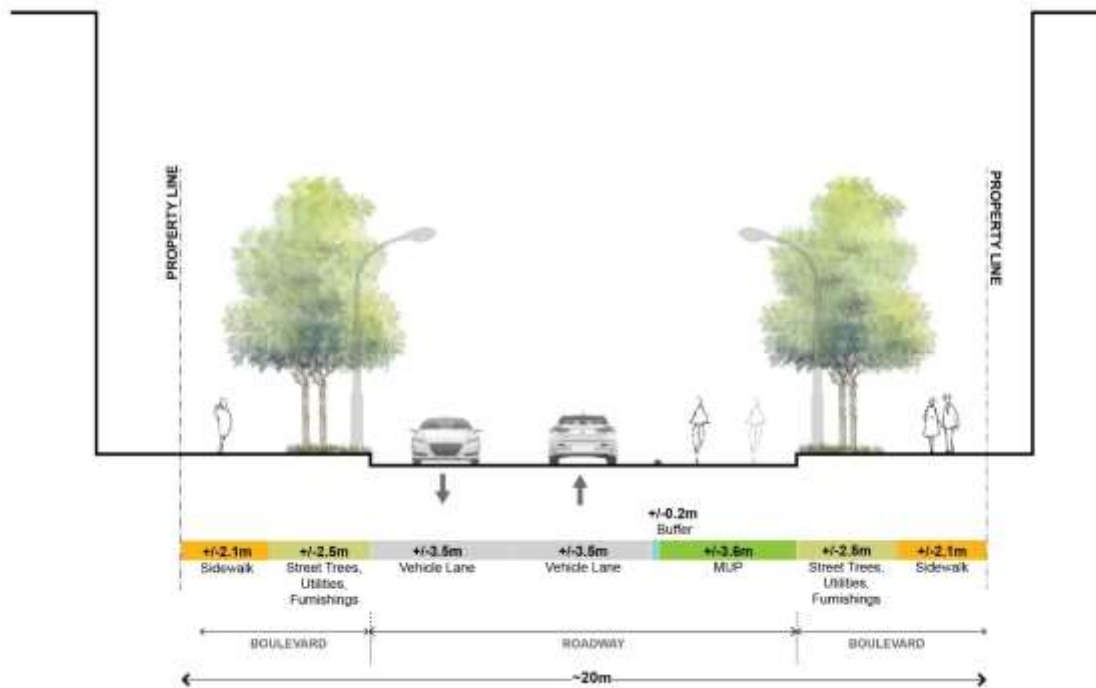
Local Road Typical Cross-Section for Roadways with Bike Lanes, 20 metre ROW
